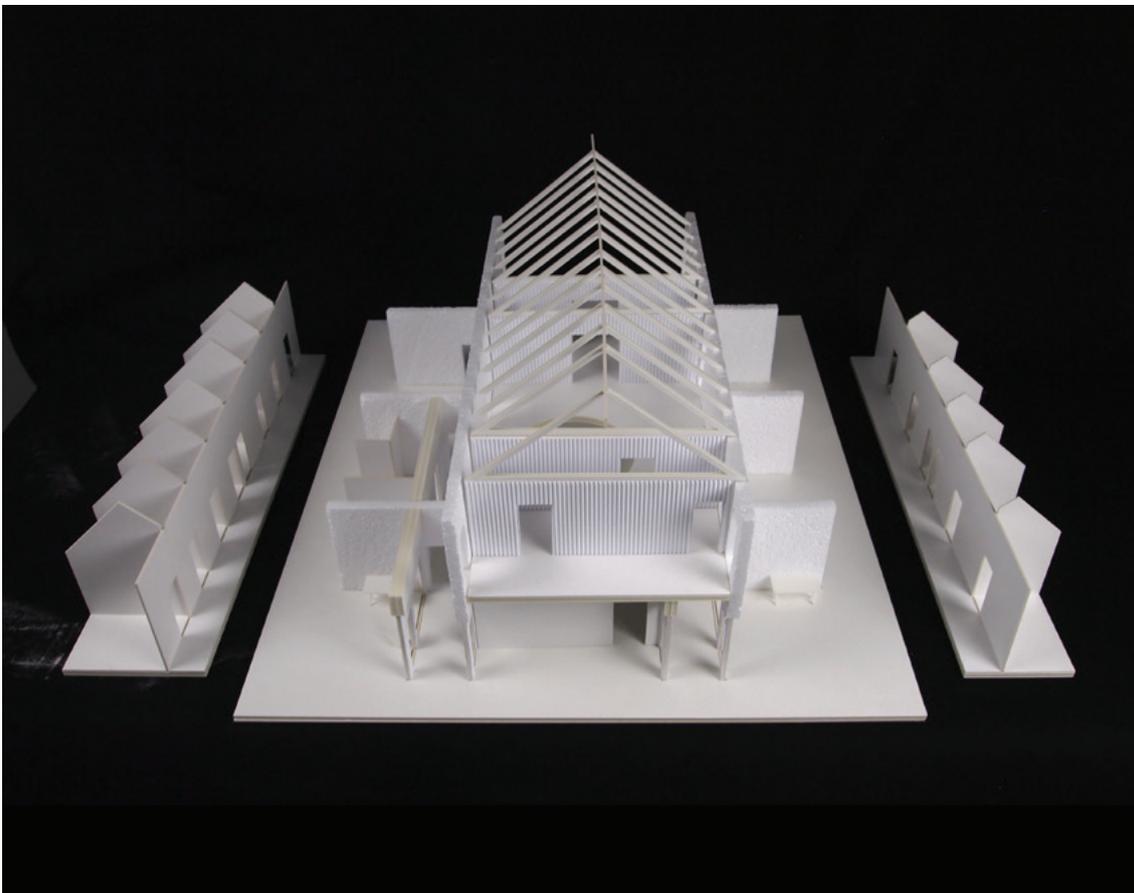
Making of facade elements, CNC-cut formwork out of foamcore cardboard.
